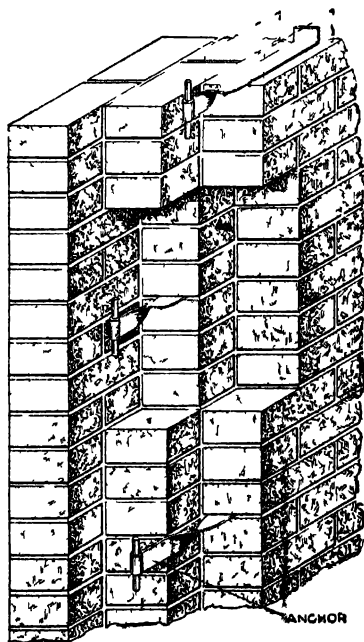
336—End of 8 in inside wall showing method of building anchor into the wall
